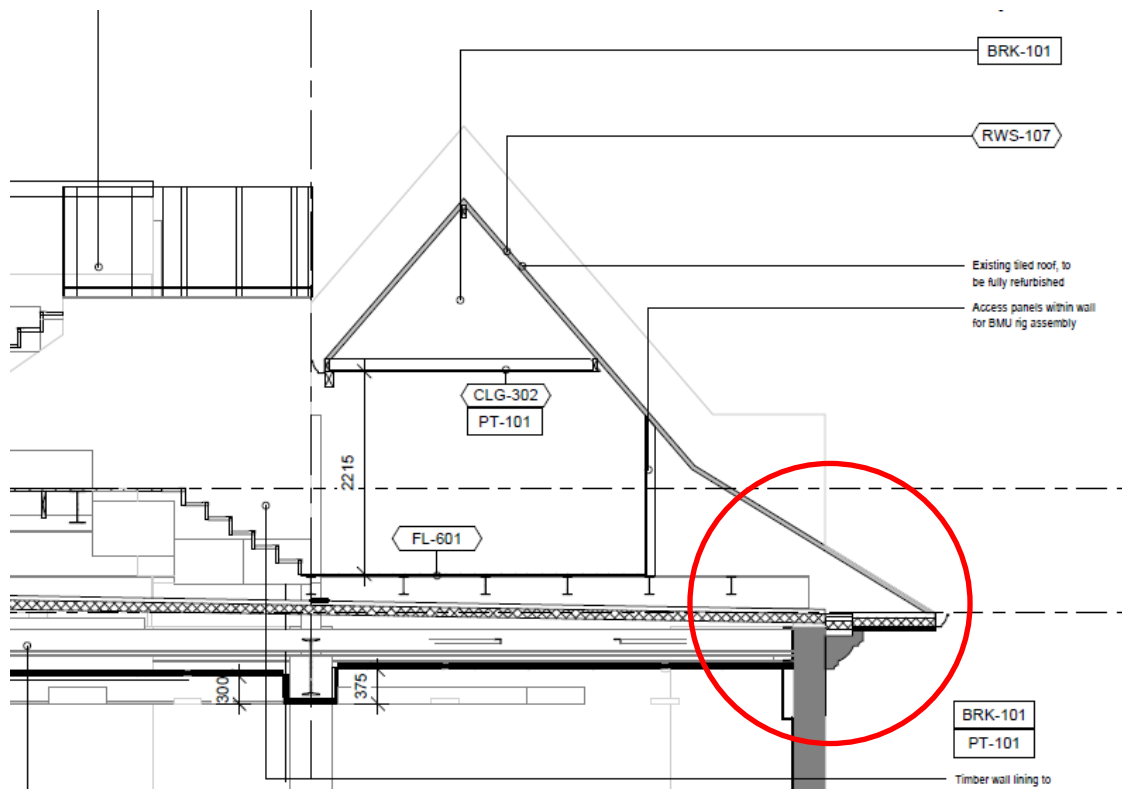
Proposed new roof section, detail at eastern boundary at tiled roof and cornice. Note: the detail of the projecting soffit is currently under design review. (Source: Make, drawing number -285-51-02-1, issue 4 [for information], 6 March 2019)
